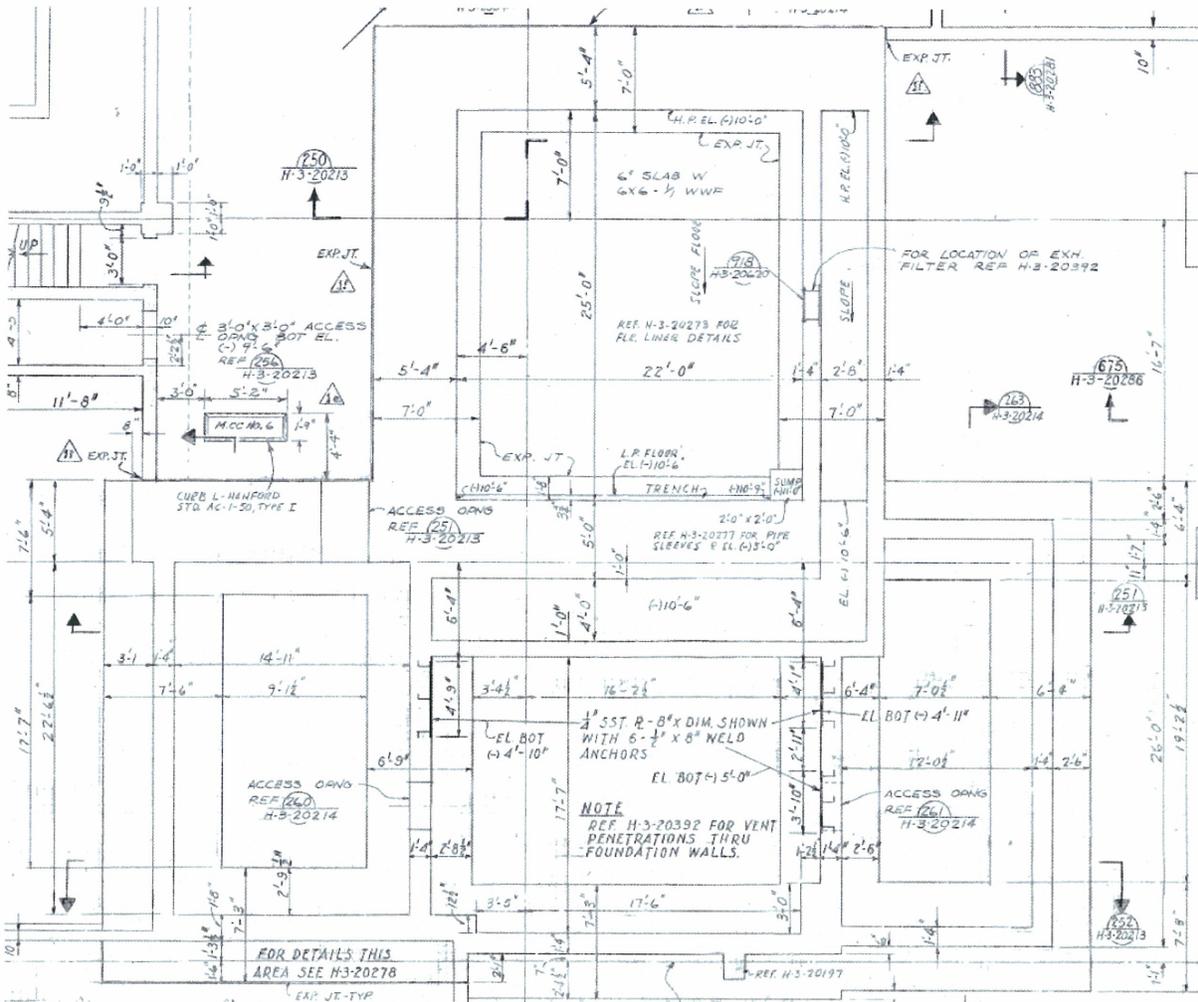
REC Foundation Plan at (-)10'-0" Elevation
